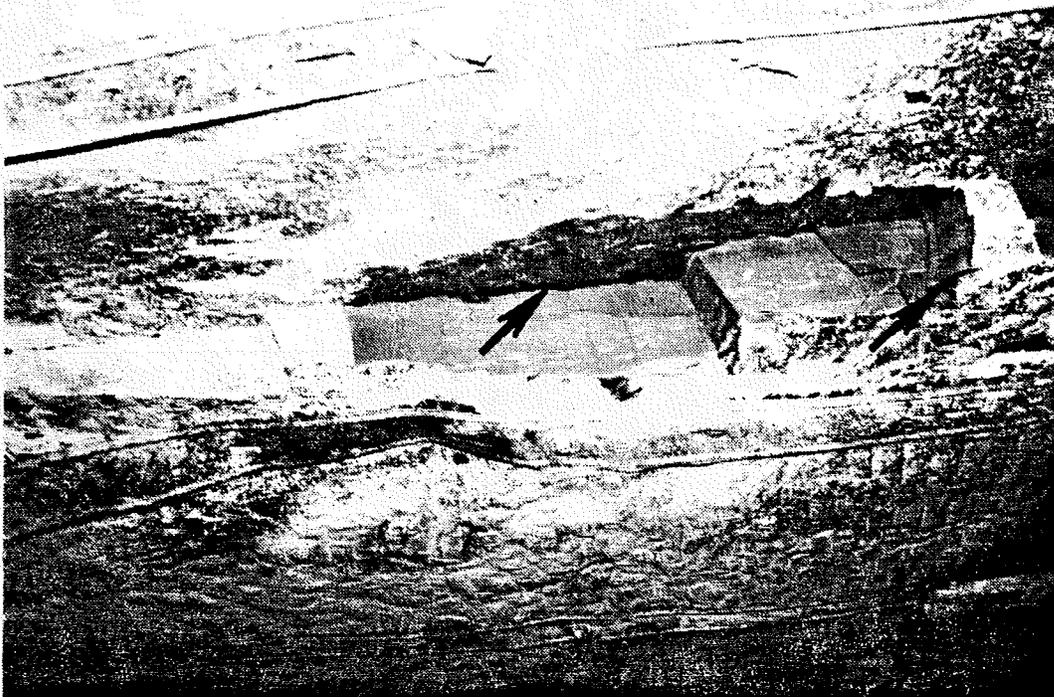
Photograph depicting weak bedding planes in shale, central Wasatch Plateau Coal Field. Arrows point to poorly bonded bedding planes in shale; bolted mats have stopped delamination. Mats are 8 in. wide.
